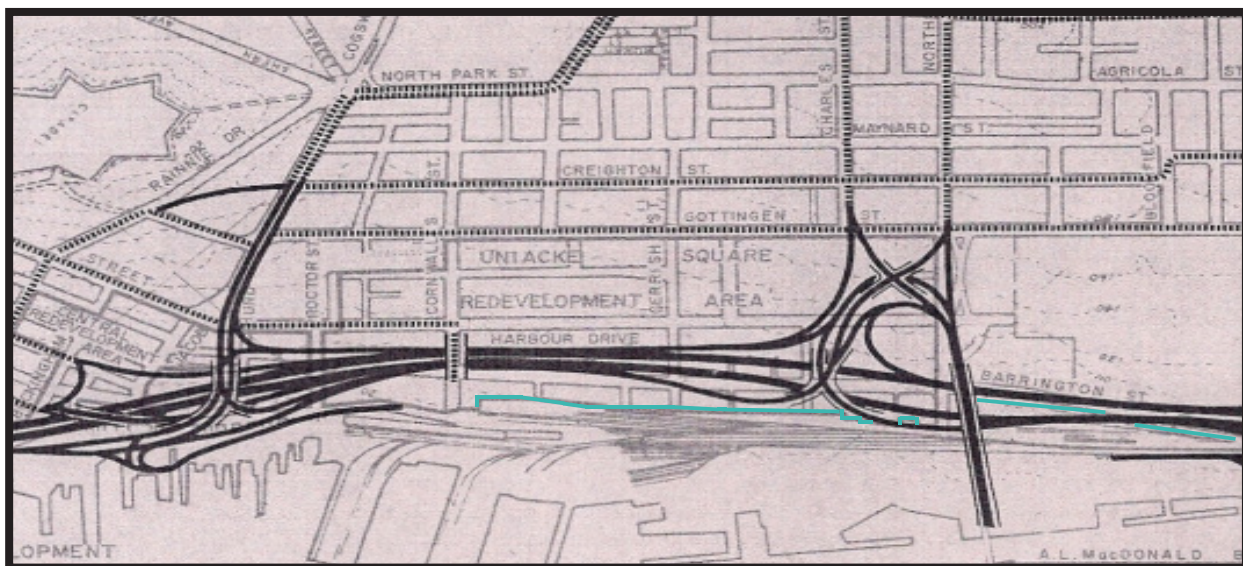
Plans of the proposed expressway, 1965. Retaining wall is highlighted in teal. (Source: Ziobrowski, 2015)
